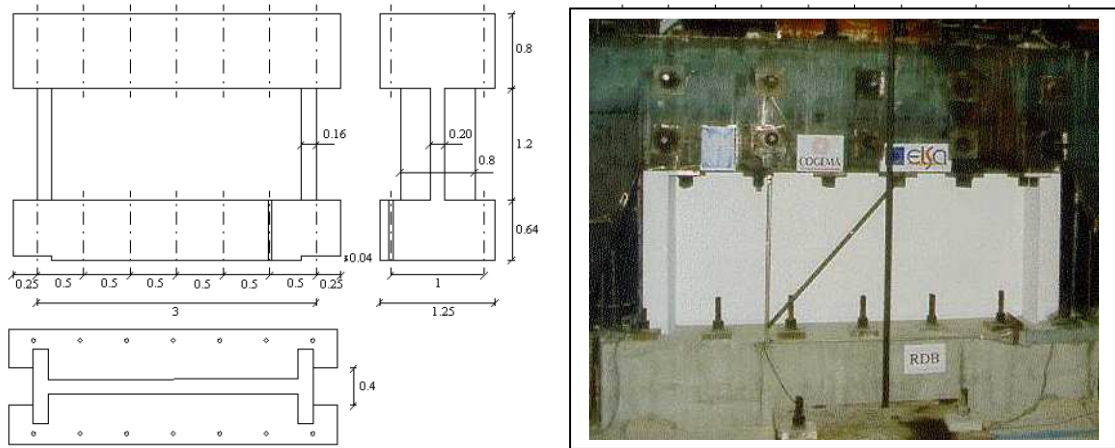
SAFE specimen geometry (Ti, i=5 to 12) and photo of T6
